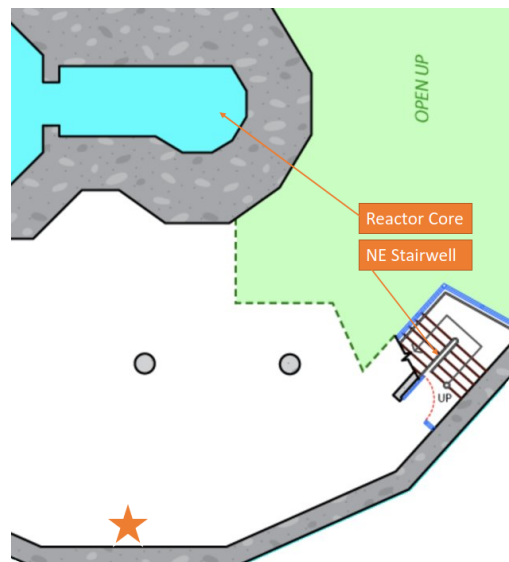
Floor plan showing Location 4, indicated by a star, in reference to the NE stairwell and the reactor core.
